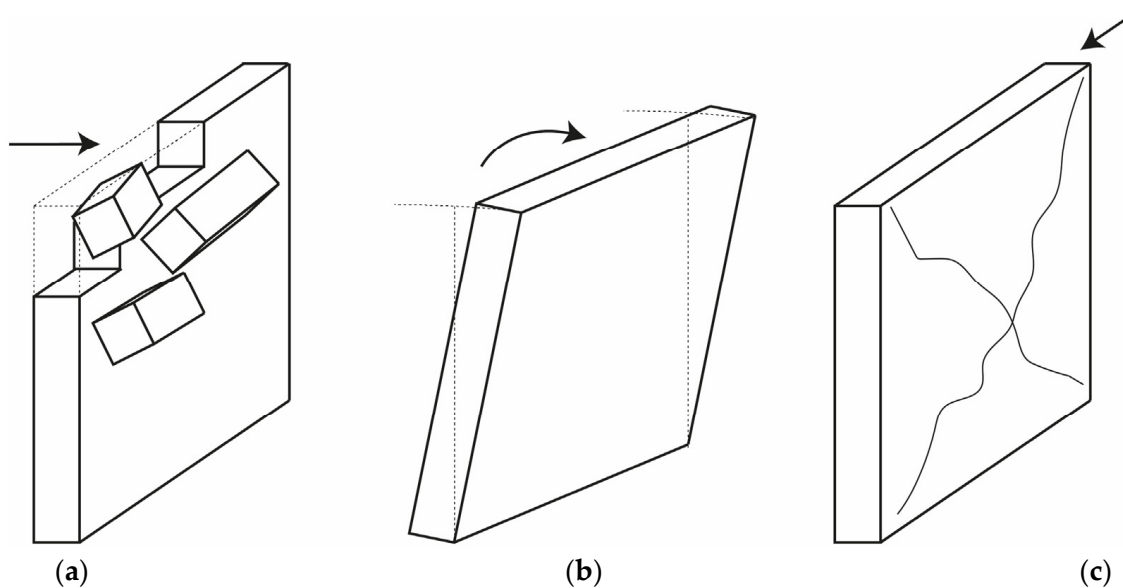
Masonry failure mechanisms—(a) masonry disintegration, (b) out-of-plane kinematic mechanism, and (c) in-plane failure.
